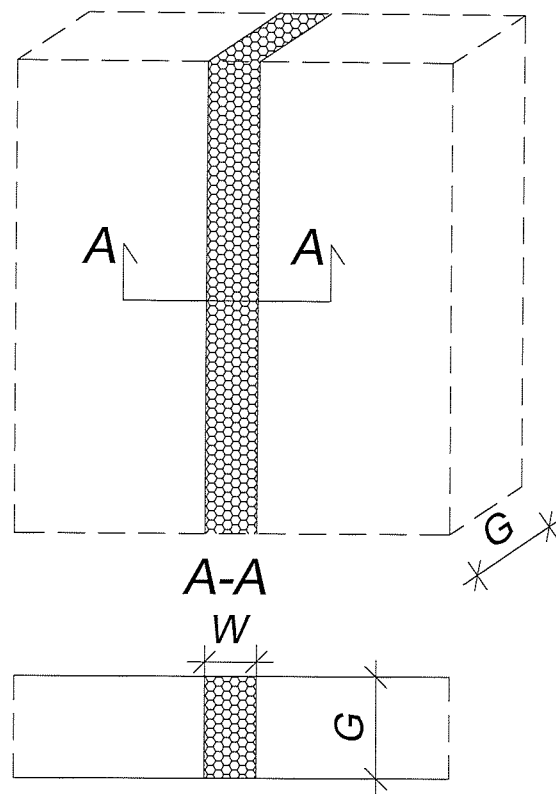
View and cross-section of the vertical linear joint seal in wall
